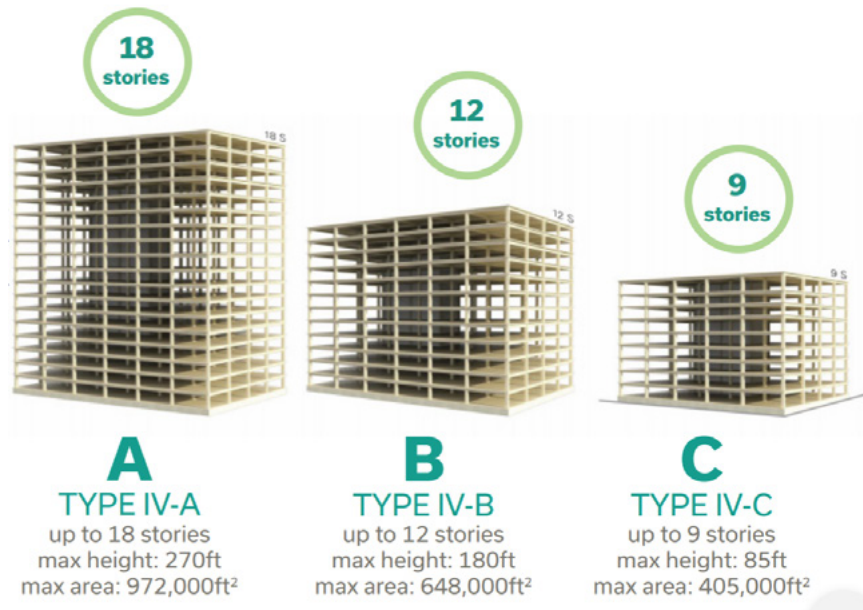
TALL WOOD CONSTRUCTION TYPES ADDED TO THE 2021 IBC
